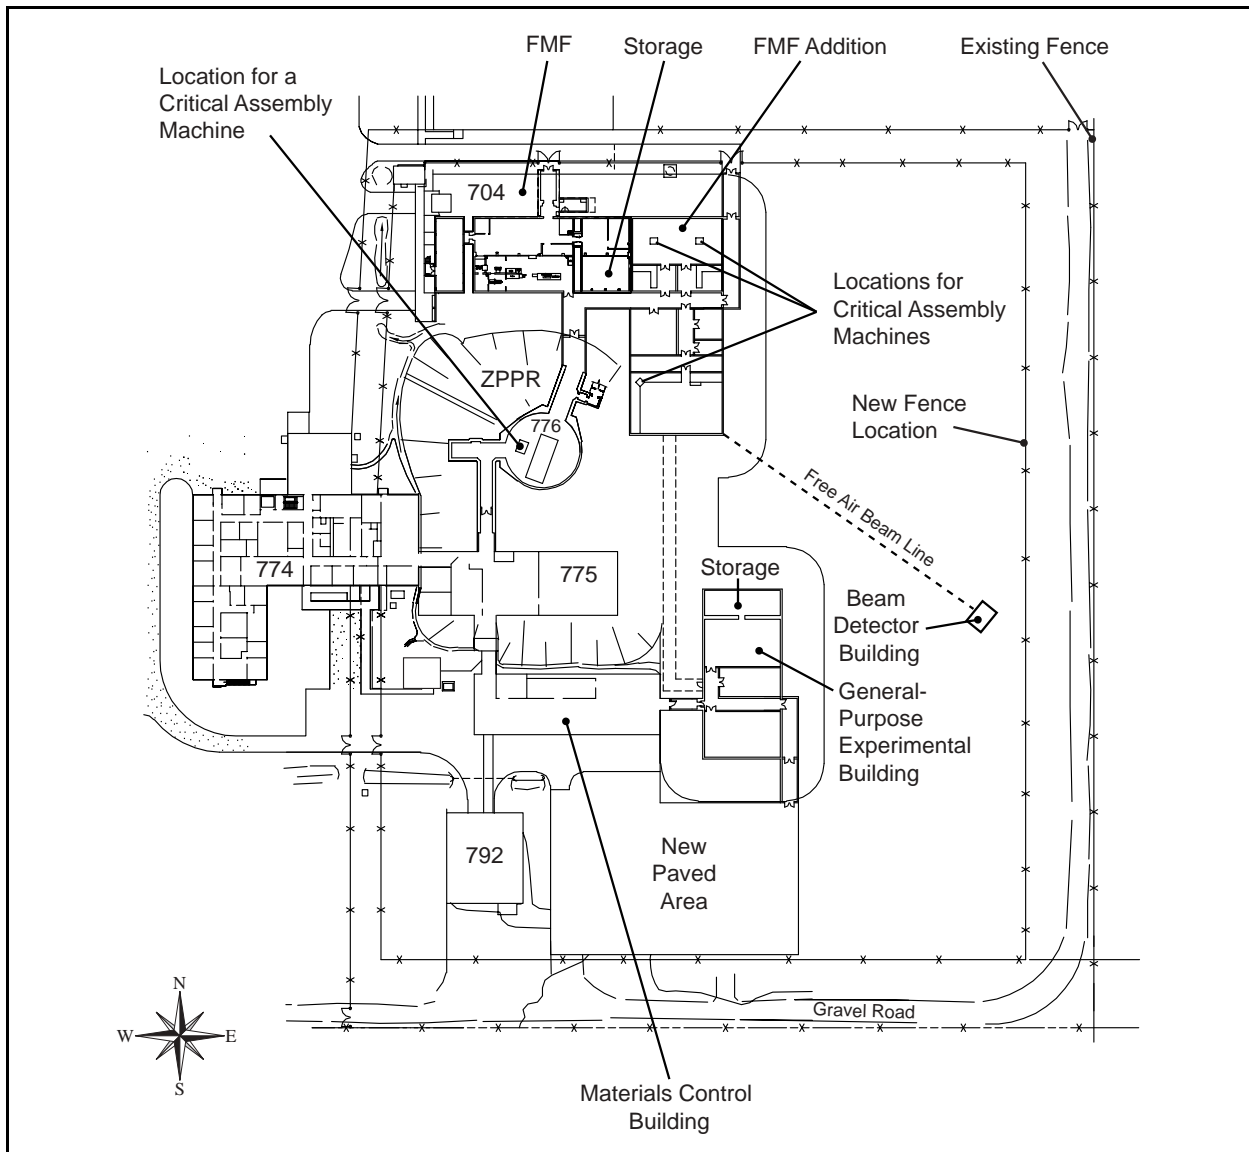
Proposed Relocation Layout (ANL-W Alternative)
